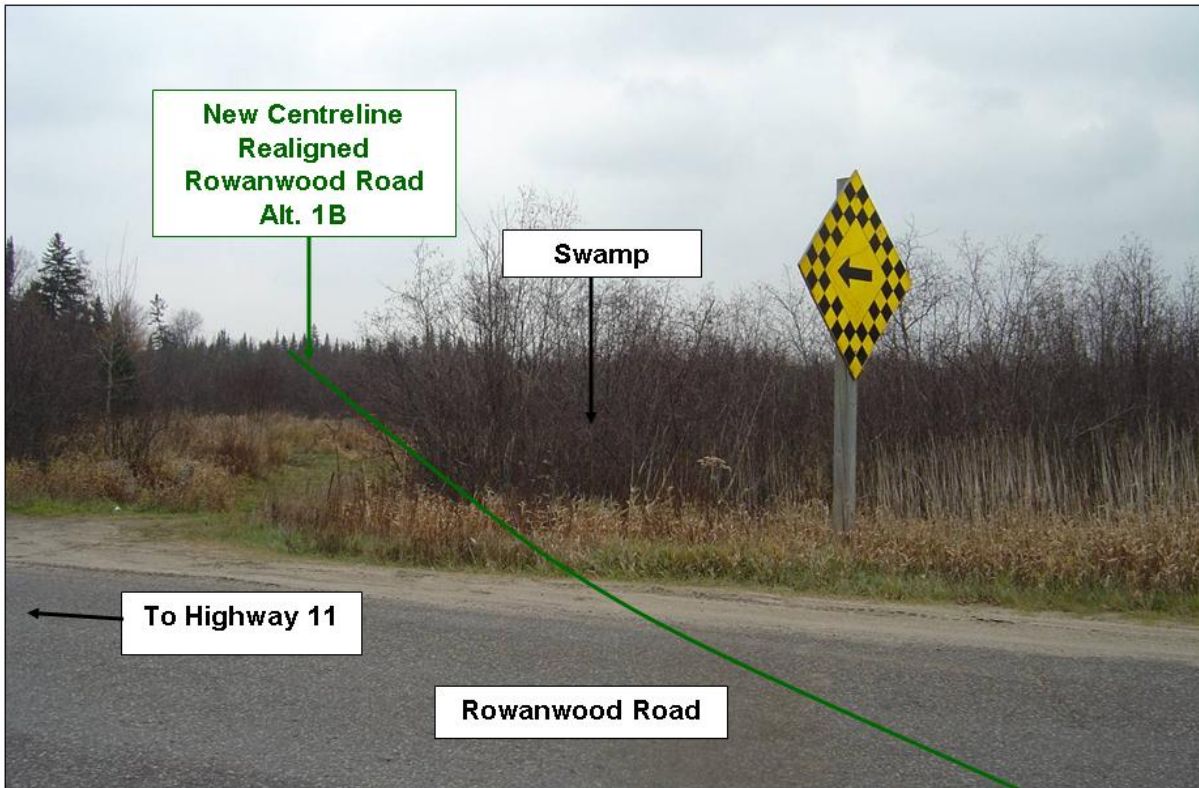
VIEW: Looking northerly from north shoulder of Rowanwood Road about 120m east of east shoulder of Highway 11 NBL. Connection of Rowanwood Road to alternative flyover at Sta. 21+400 or interchange at Sta. 21+780 are illustrated. Roads are in the Bullen Creek floodplain. (Sept. 26, 2008)
